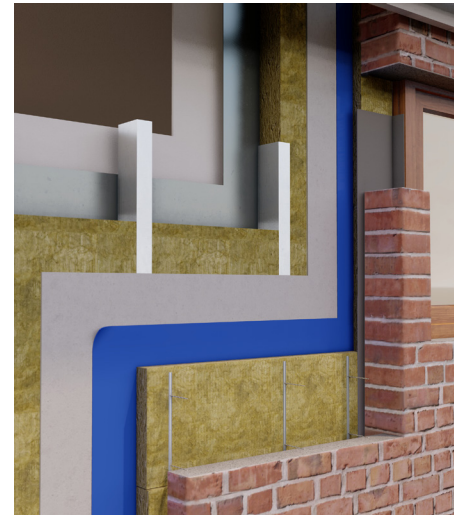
RockClose EN - masonry to steel frame with cement particle board application
